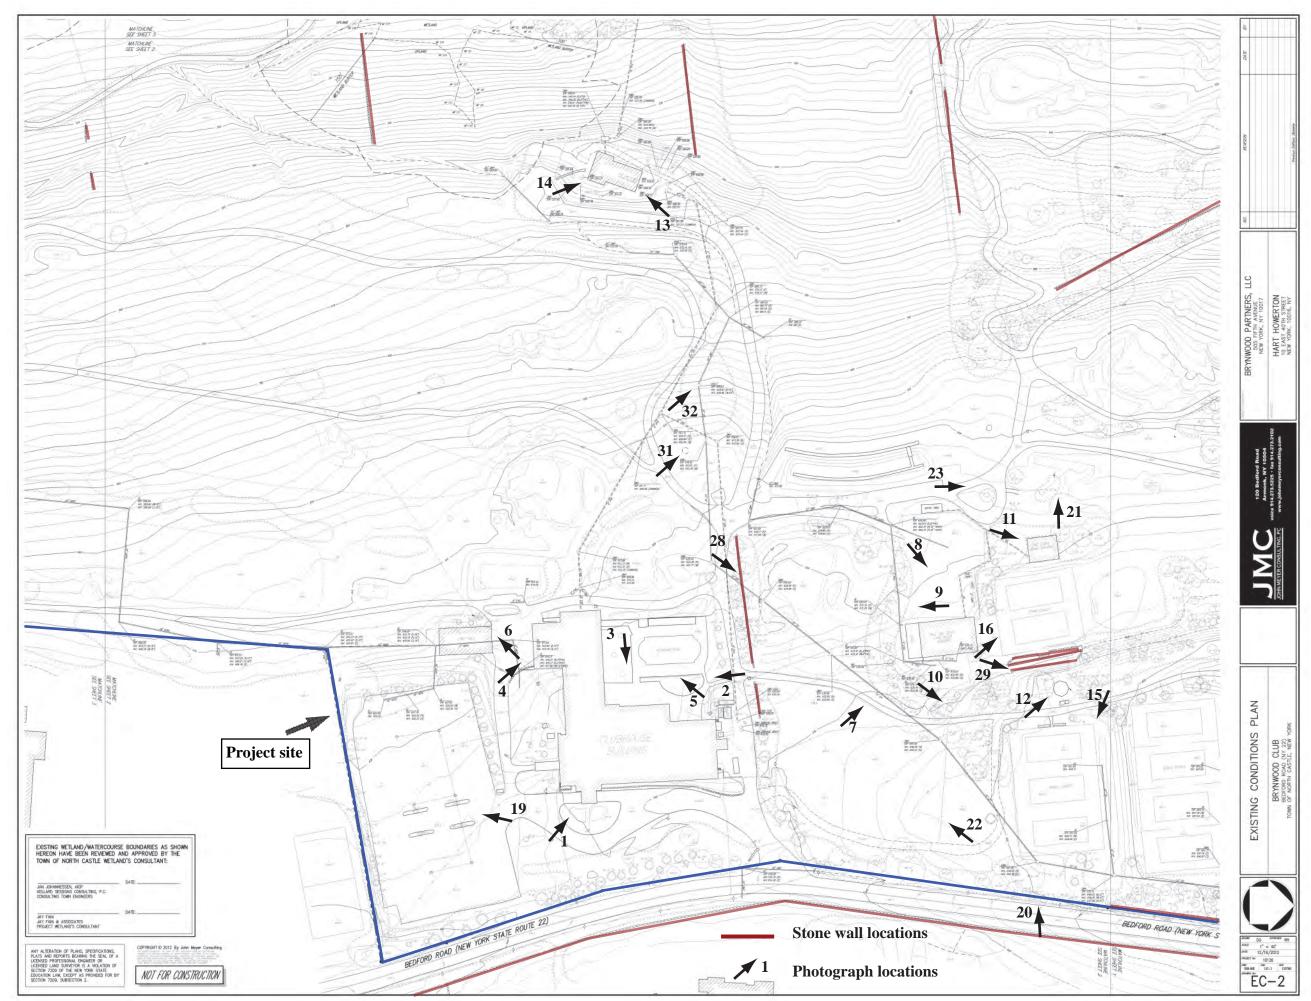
Section of project site topographical survey showing existing conditions, stone walls, and photograph locations (JMC 2012).
